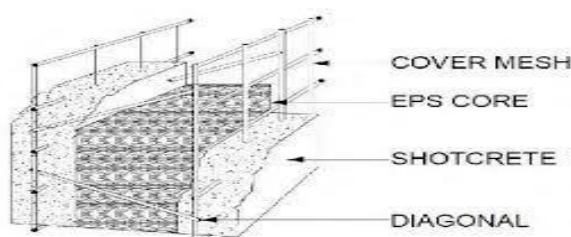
Schematic diagram of Cross section of EPS core wall panel.
